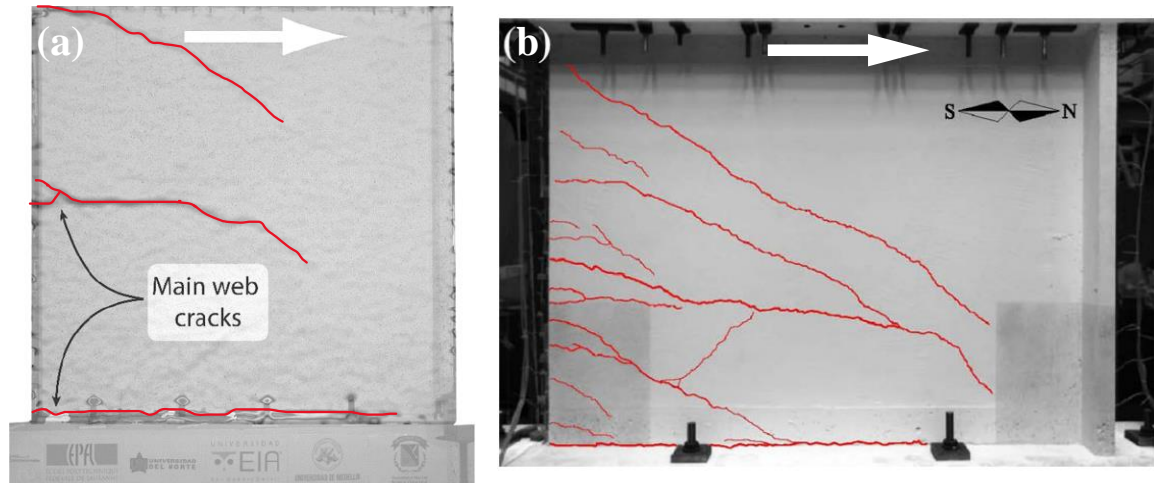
Crack patterns observed in thin RC wall web boundaries reinforced with (a) cold-drawn WWW (Blandón et al., 2018) and (b) ductile hot-rolled rebars (Rosso et al., 2016).
